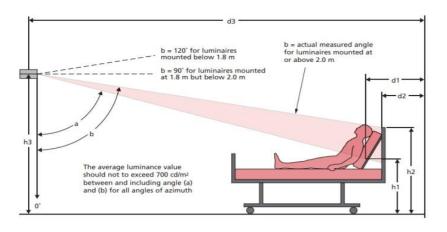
Elevation Angles for Wall Mounted Luminaires
